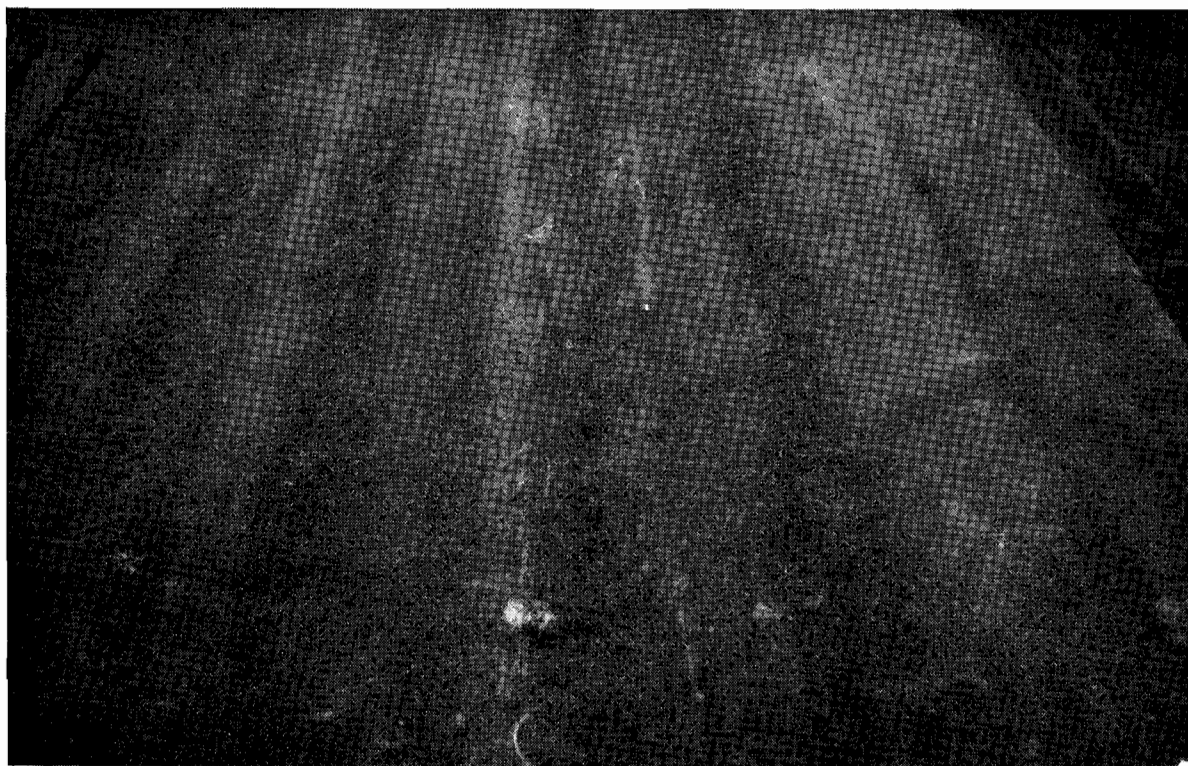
Timber deck after treatment with Polyester resin and fibre-glass sheet.
